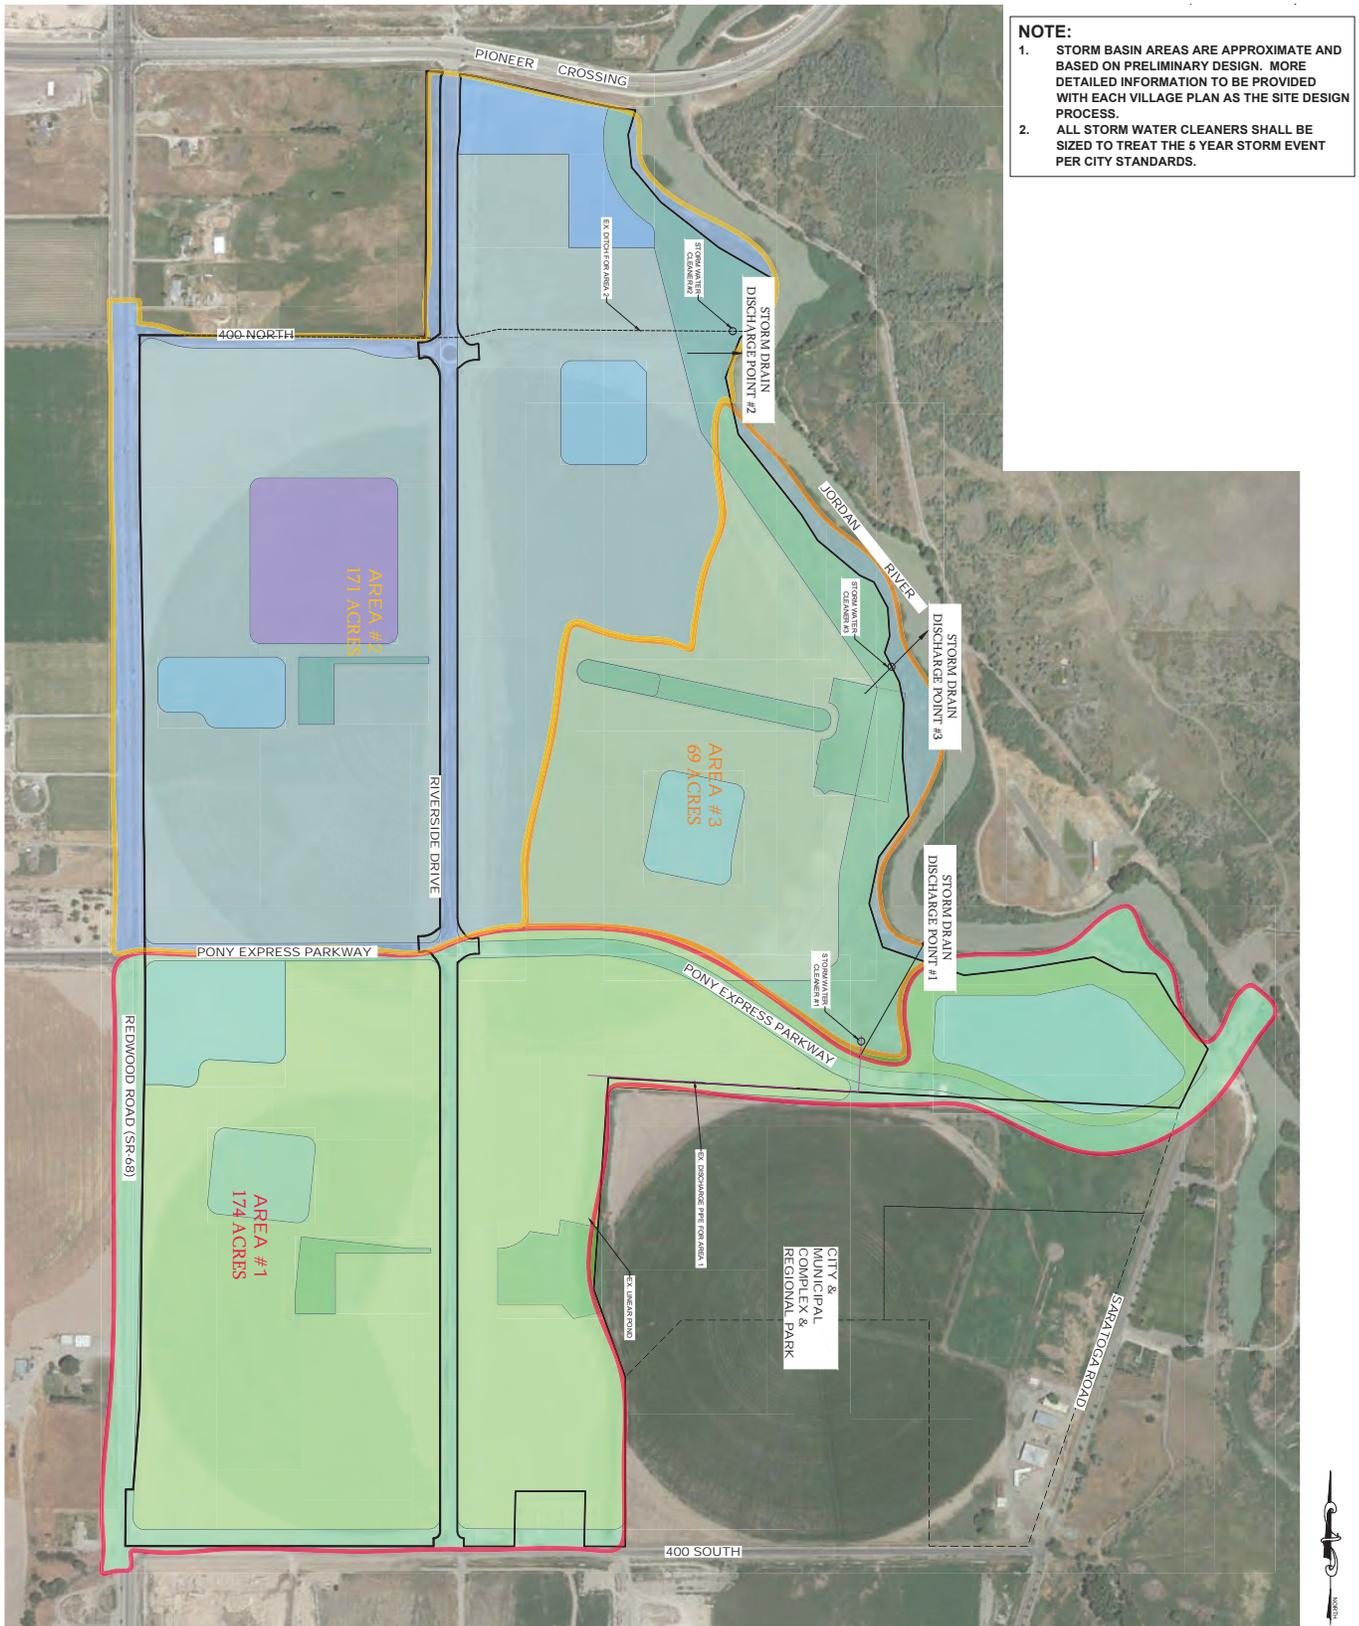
STORM DRAIN MASTER PLAN
